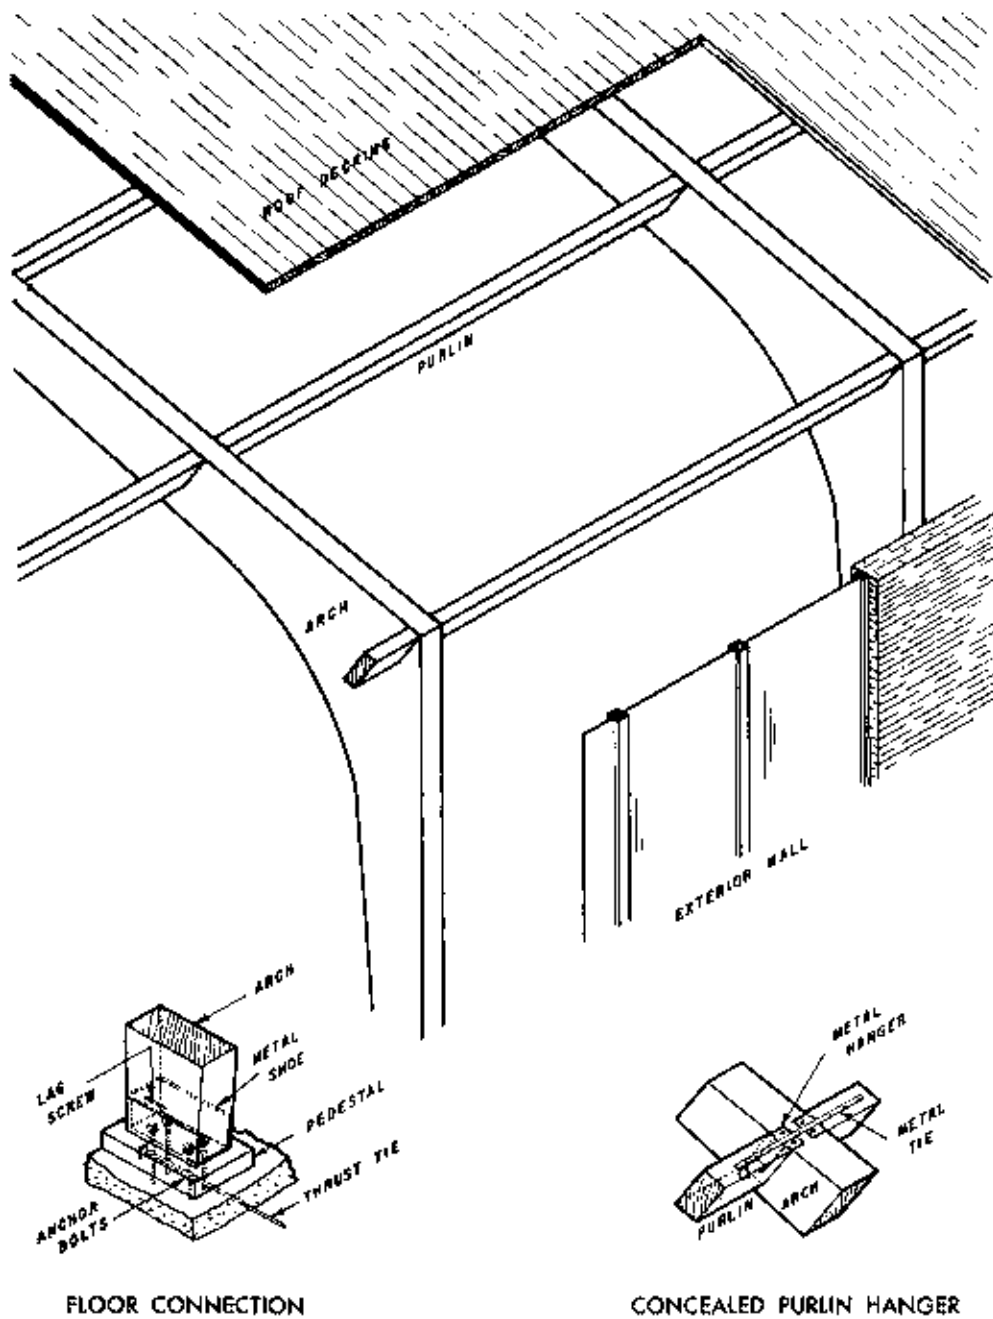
Rigid arch frame supported at floor. (Courtesy of American Forest and Paper Association)
